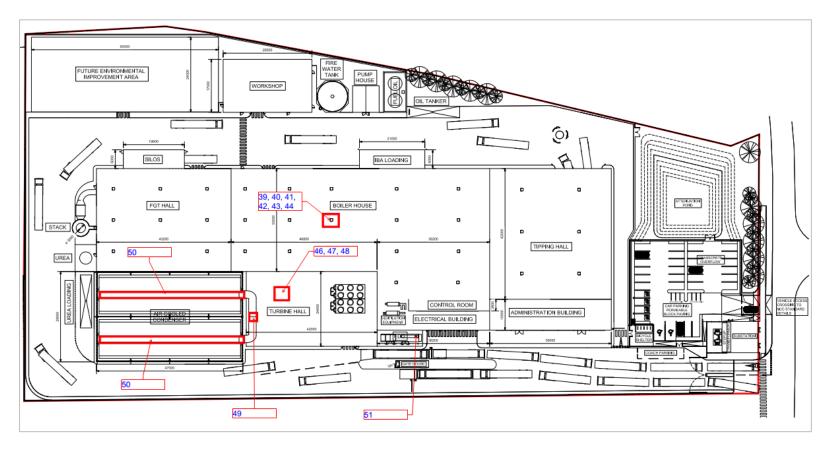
Annotated Site Plan showing OTNOC sources (provided by Fichtner)
